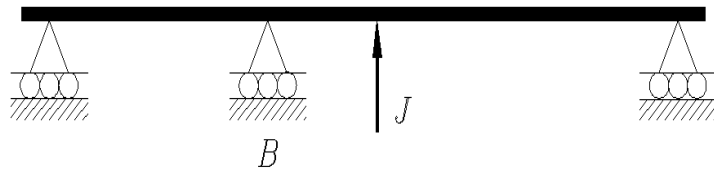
Bearing(B) and jack(J) position for jack up measurement
